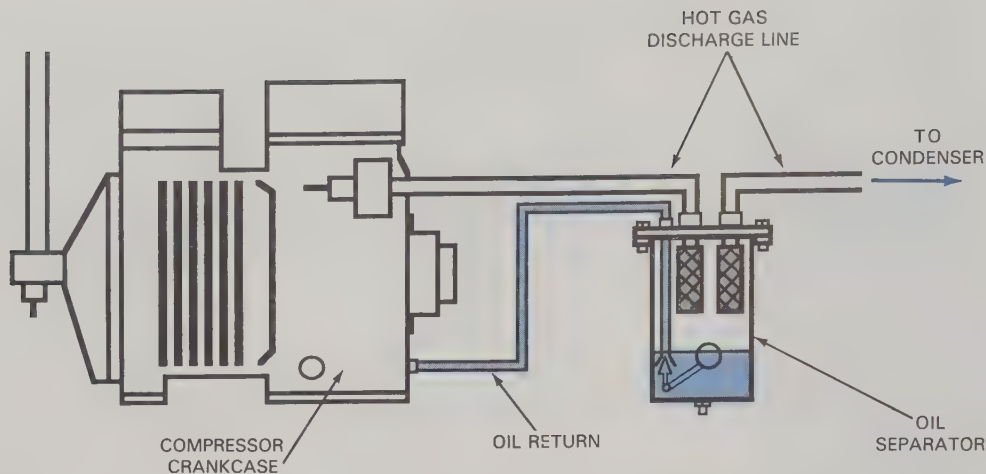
The oil separator is placed between the compressor and condenser to remove oil from the hot gas being discharged from the compressor. The oil is returned to the compressor crankcase.
